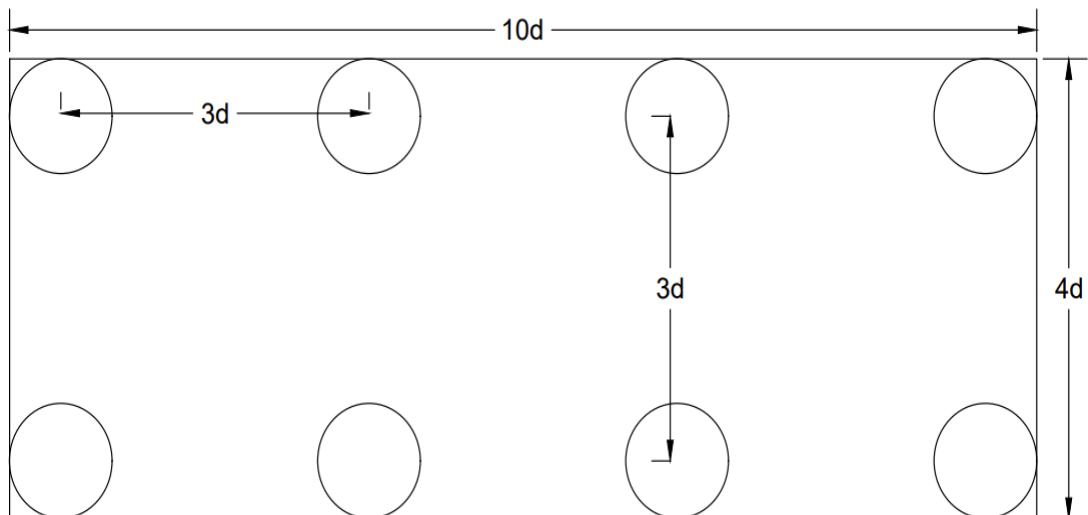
8 pile arrangement with 40 sqm. Raft size
